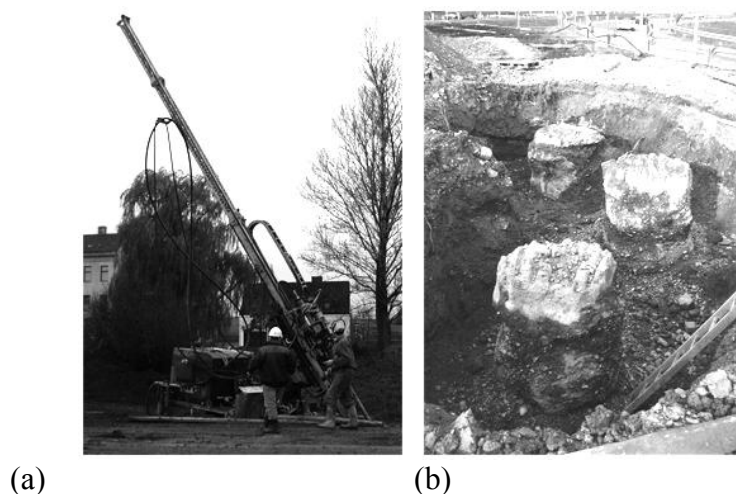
(a) Drilling rig used for jet grouting and (b) test columns after excavation
